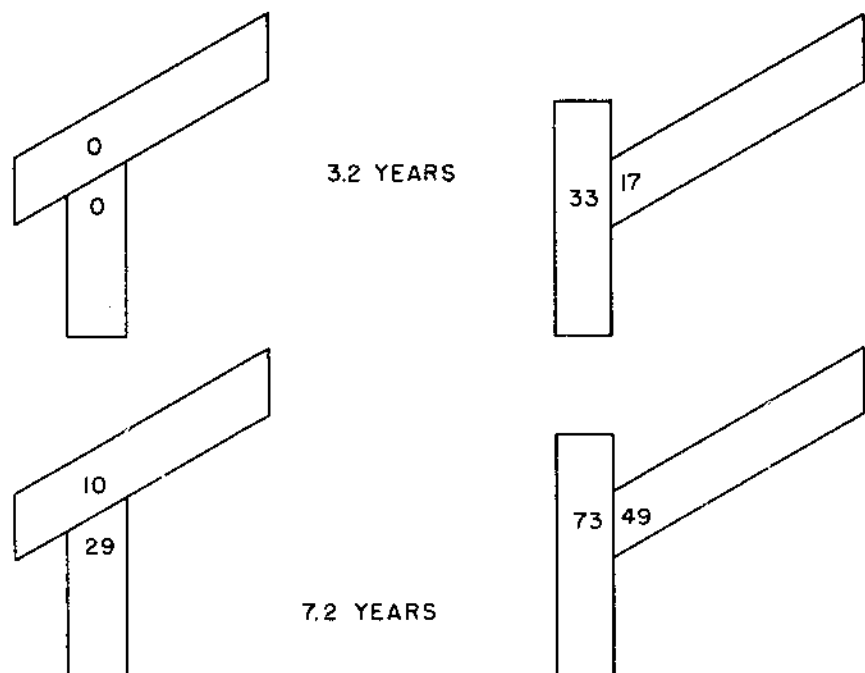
Amount of decay (on a scale of 0 to 100) in painted step rails and newels when the rail abutted or capped the newel.
